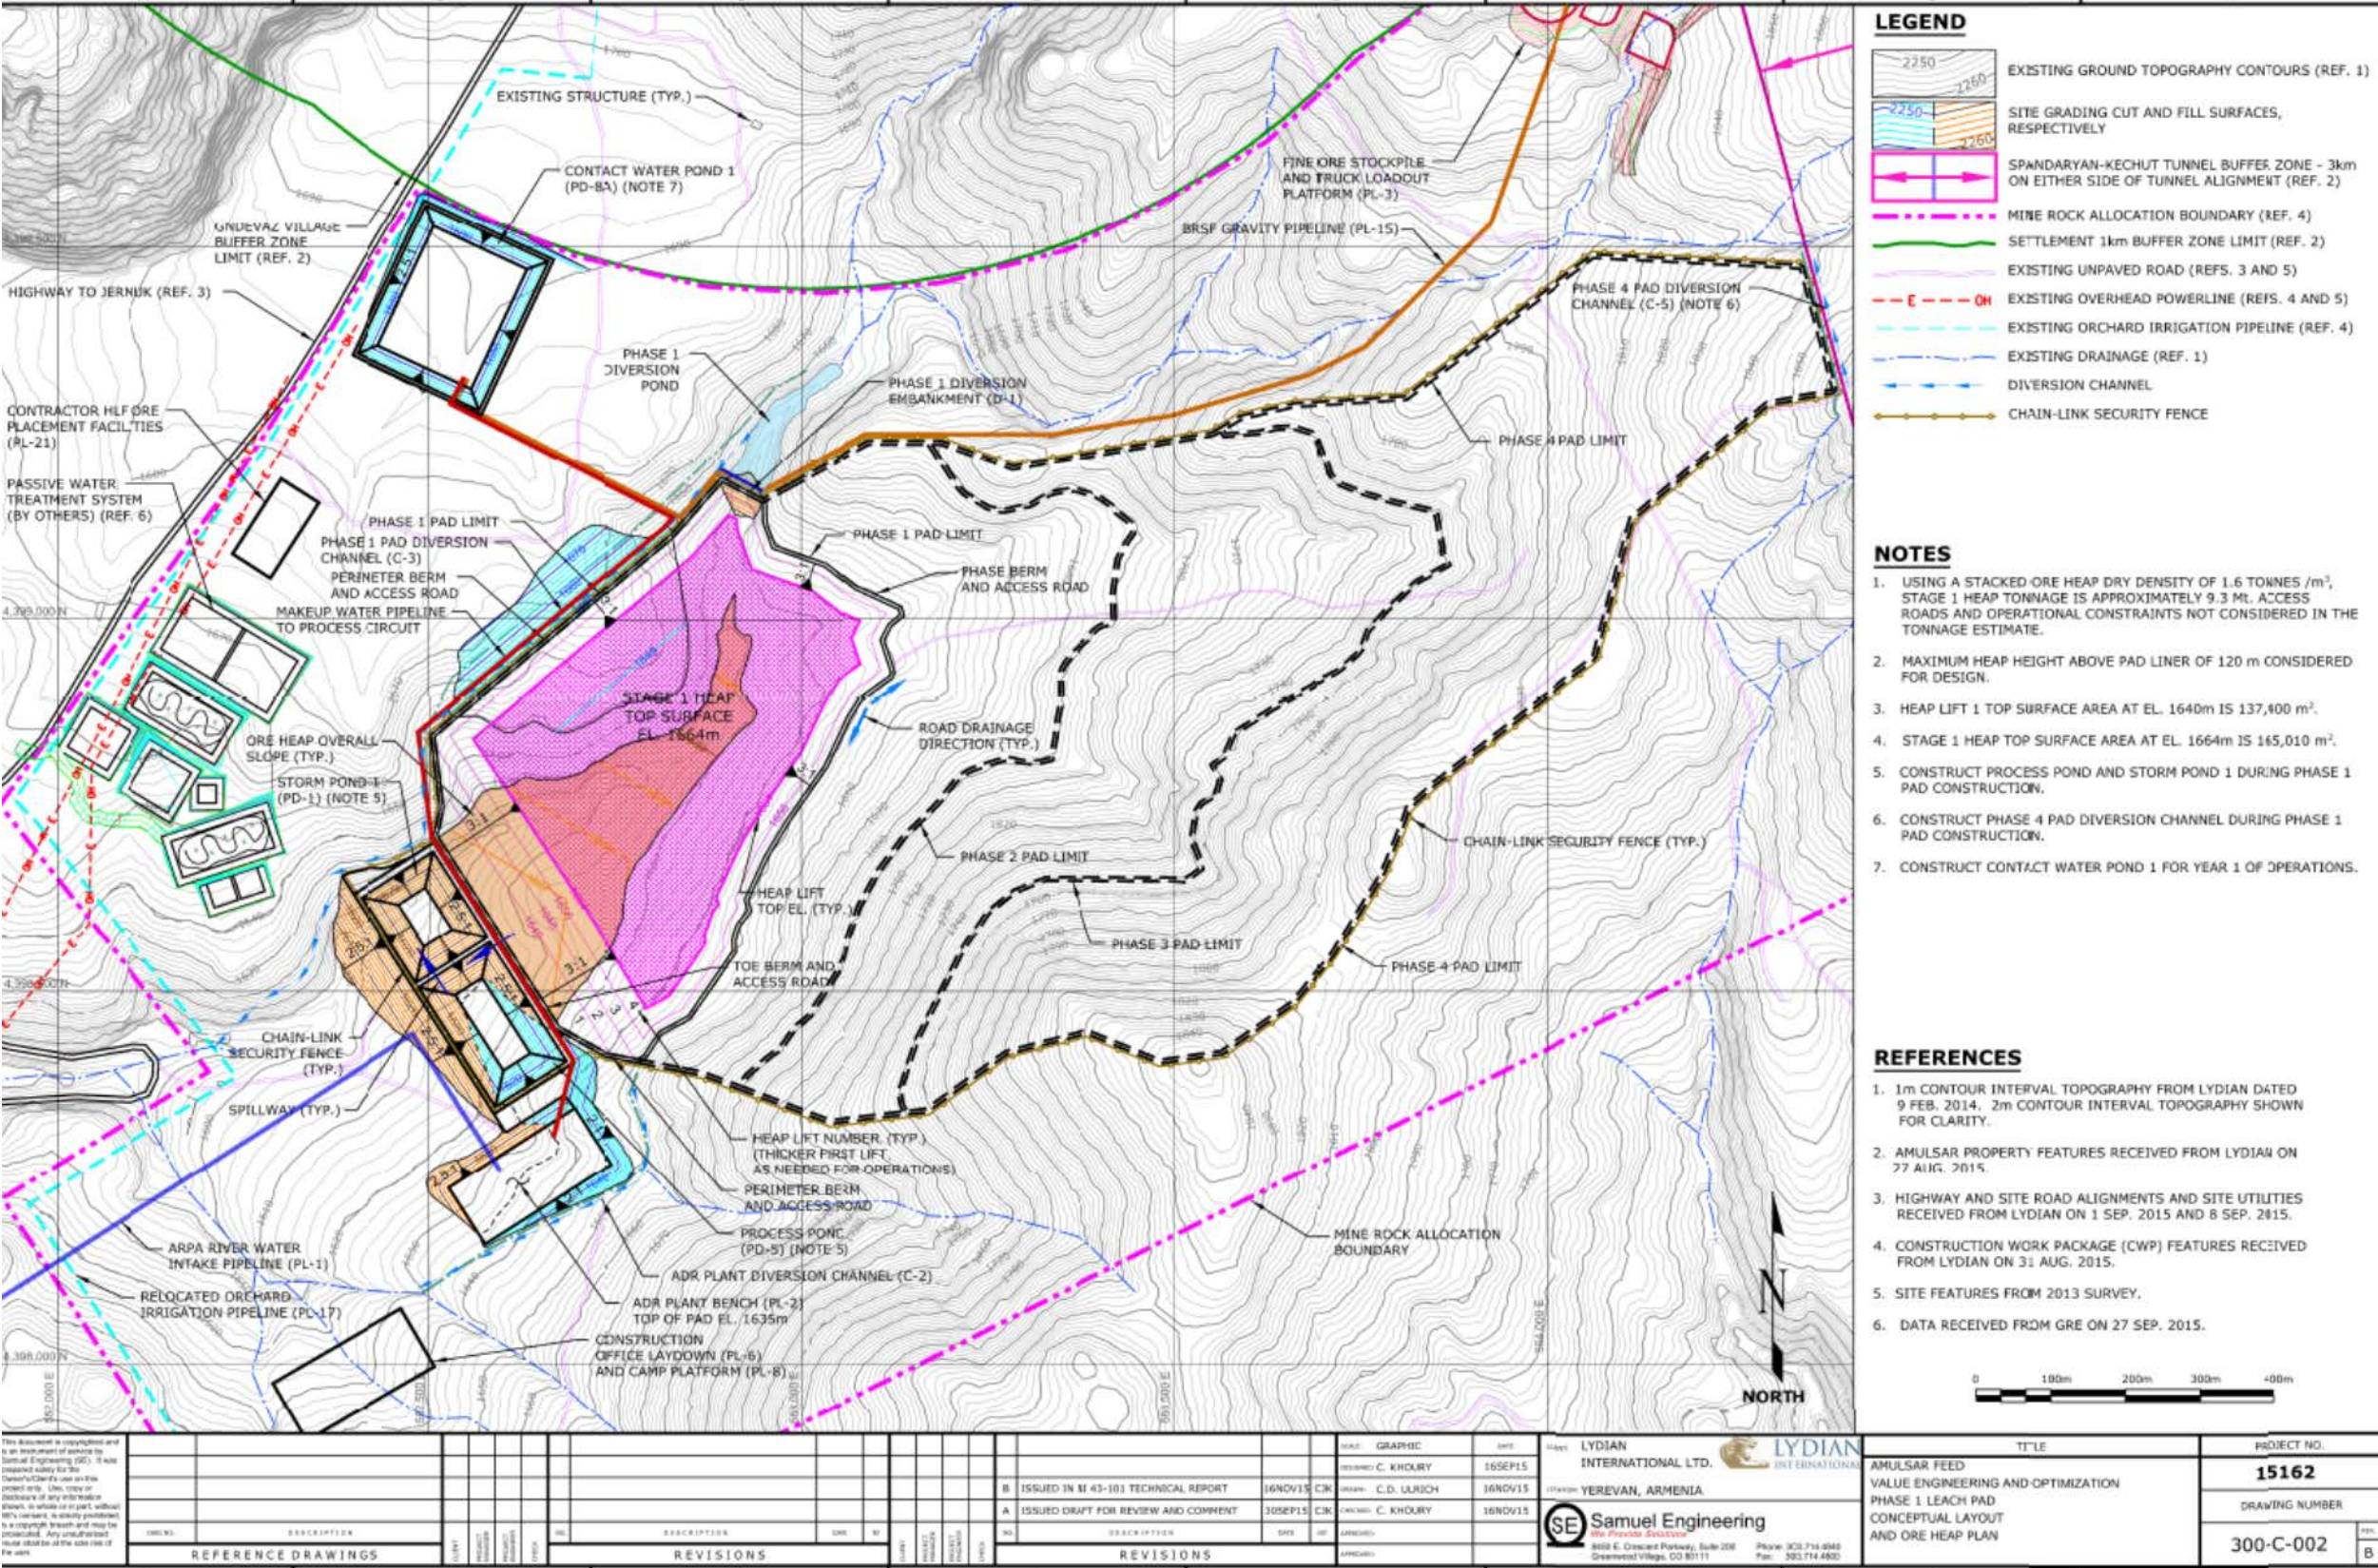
Phase 1 Leach Pad Layout and Ore Heap Plan
